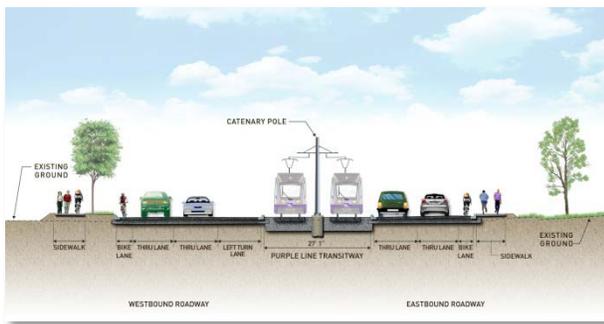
Wayne Avenue Typical Section, Looking East
